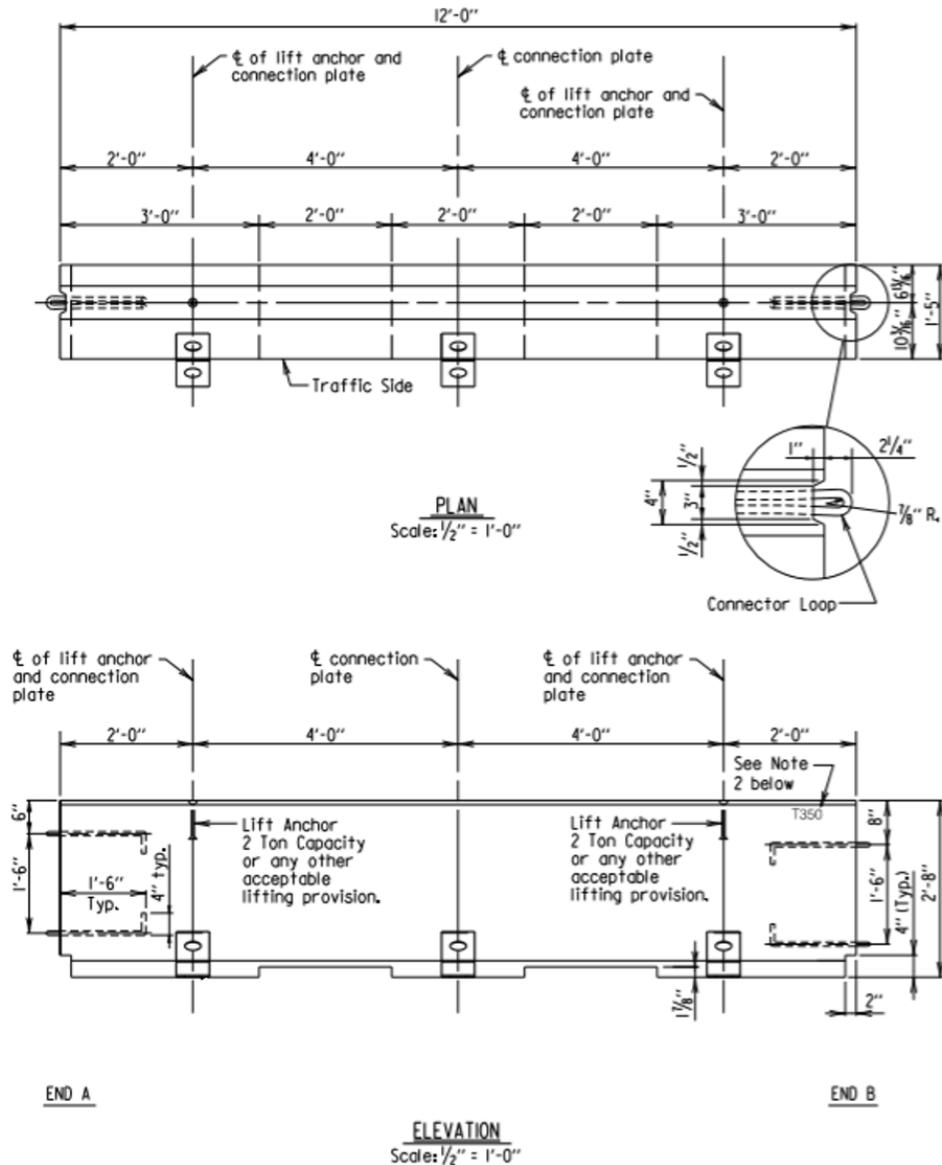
Originally Proposed Design (Not to Be Used for Construction)—General Geometry Details.
